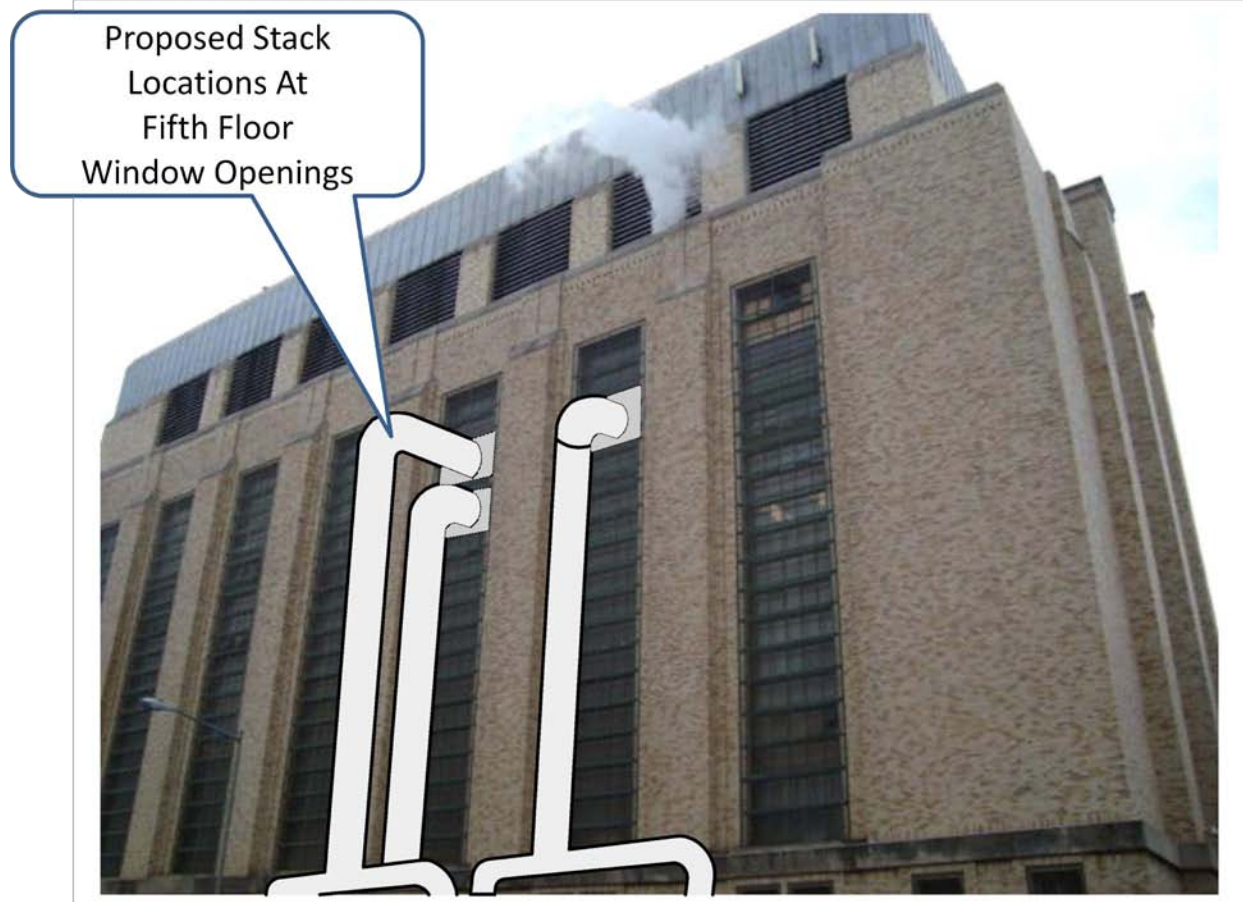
North Elevation Photo Showing Proposed Stack Locations
